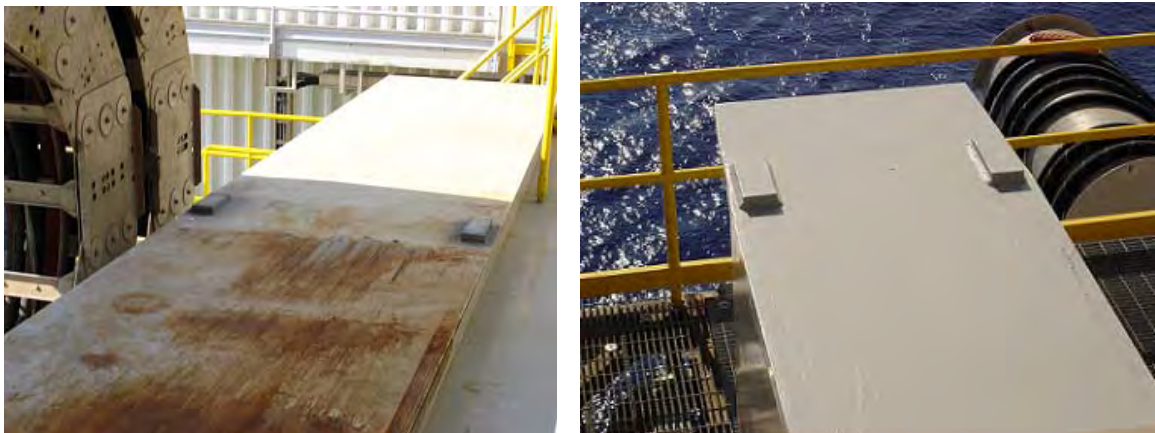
Stops Welded to Top of Mad Dog Skid Beam
